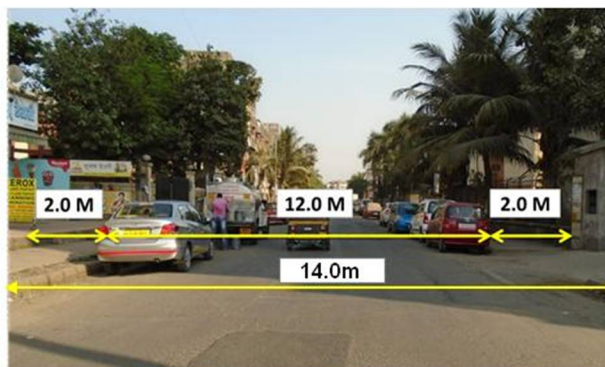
Surrounding Road Network and Traffic Survey Location
